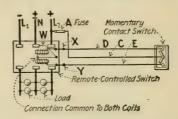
Showing a method of fusing the control circuit of a remote-controlled switch which may be permissible for a three-wire single-phase circuit.
